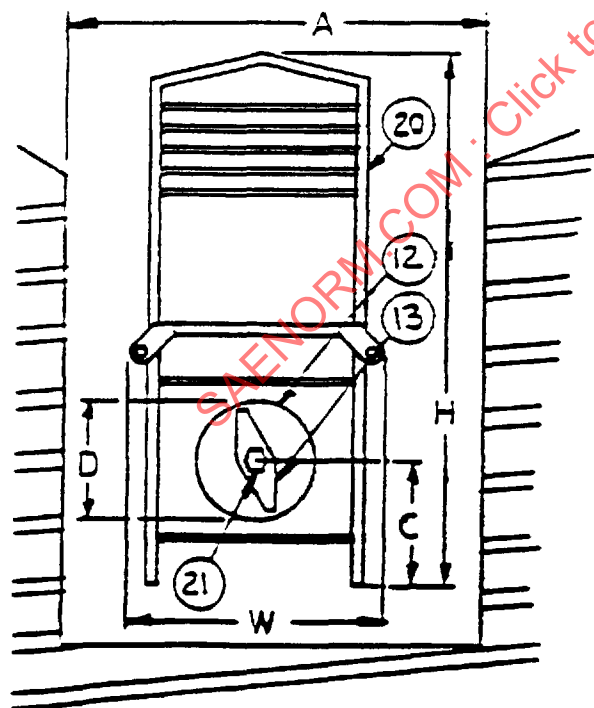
CRADLE-TYPE AUGER BORING MACHINE
